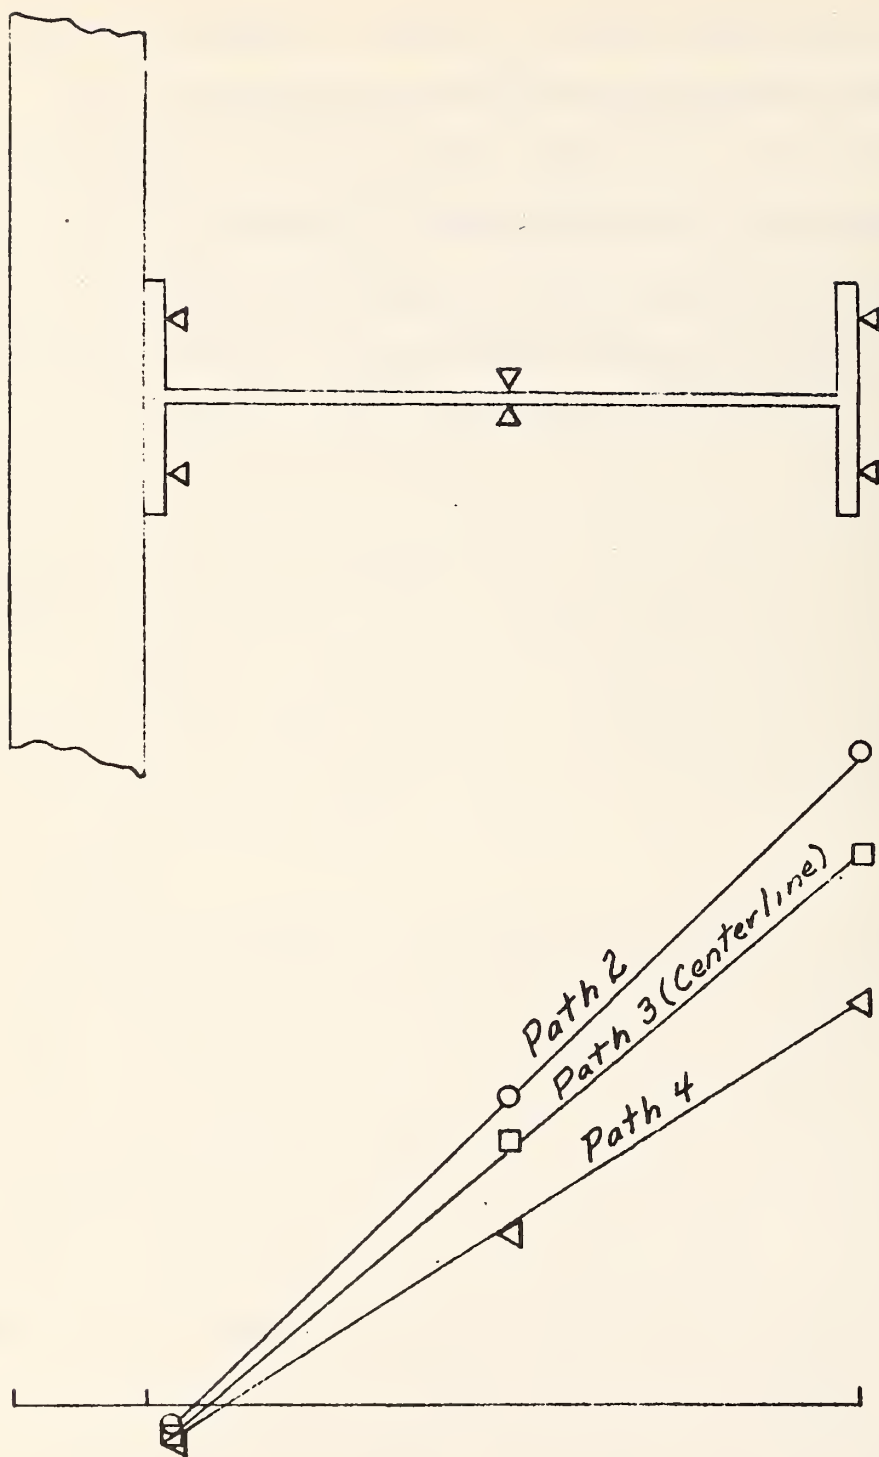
NEUTRAL AXIS LOCATION FROM MEASURED STRAINS WITH HET-70 LOADING, INTERIOR GIRDER NEAR MID-SPAN OF 90' SPAN, FOUR SPAN CONTINUOUS STEEL GIRDER BRIDGE.
